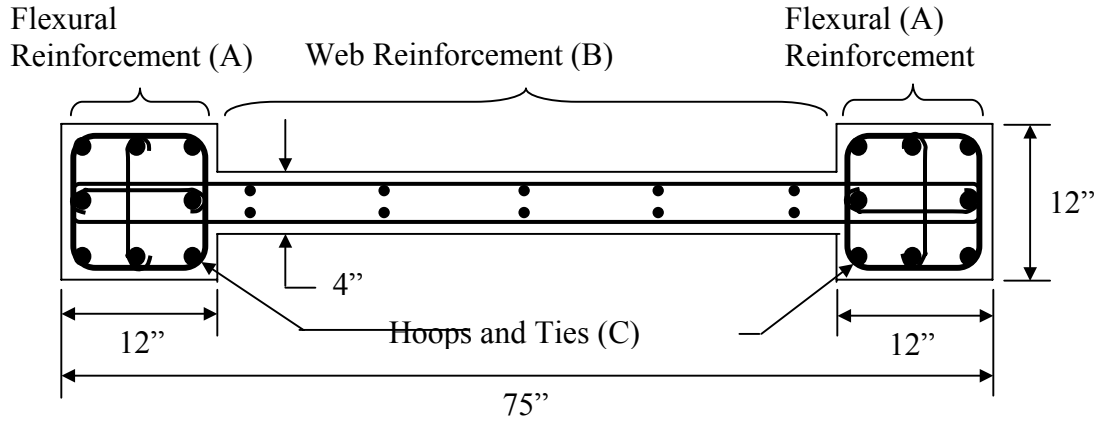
Typical Reinforcement Details for Dimensions for PCA Walls
